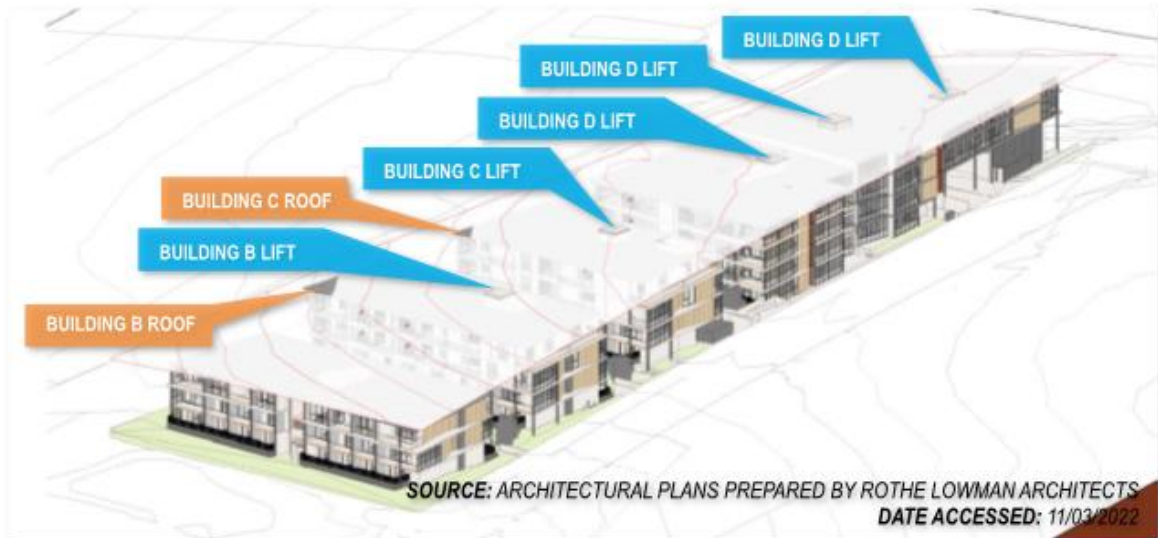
OVERALL SITE 3D HEIGHT PLANE SHOWING HEIGHT BREACHES
